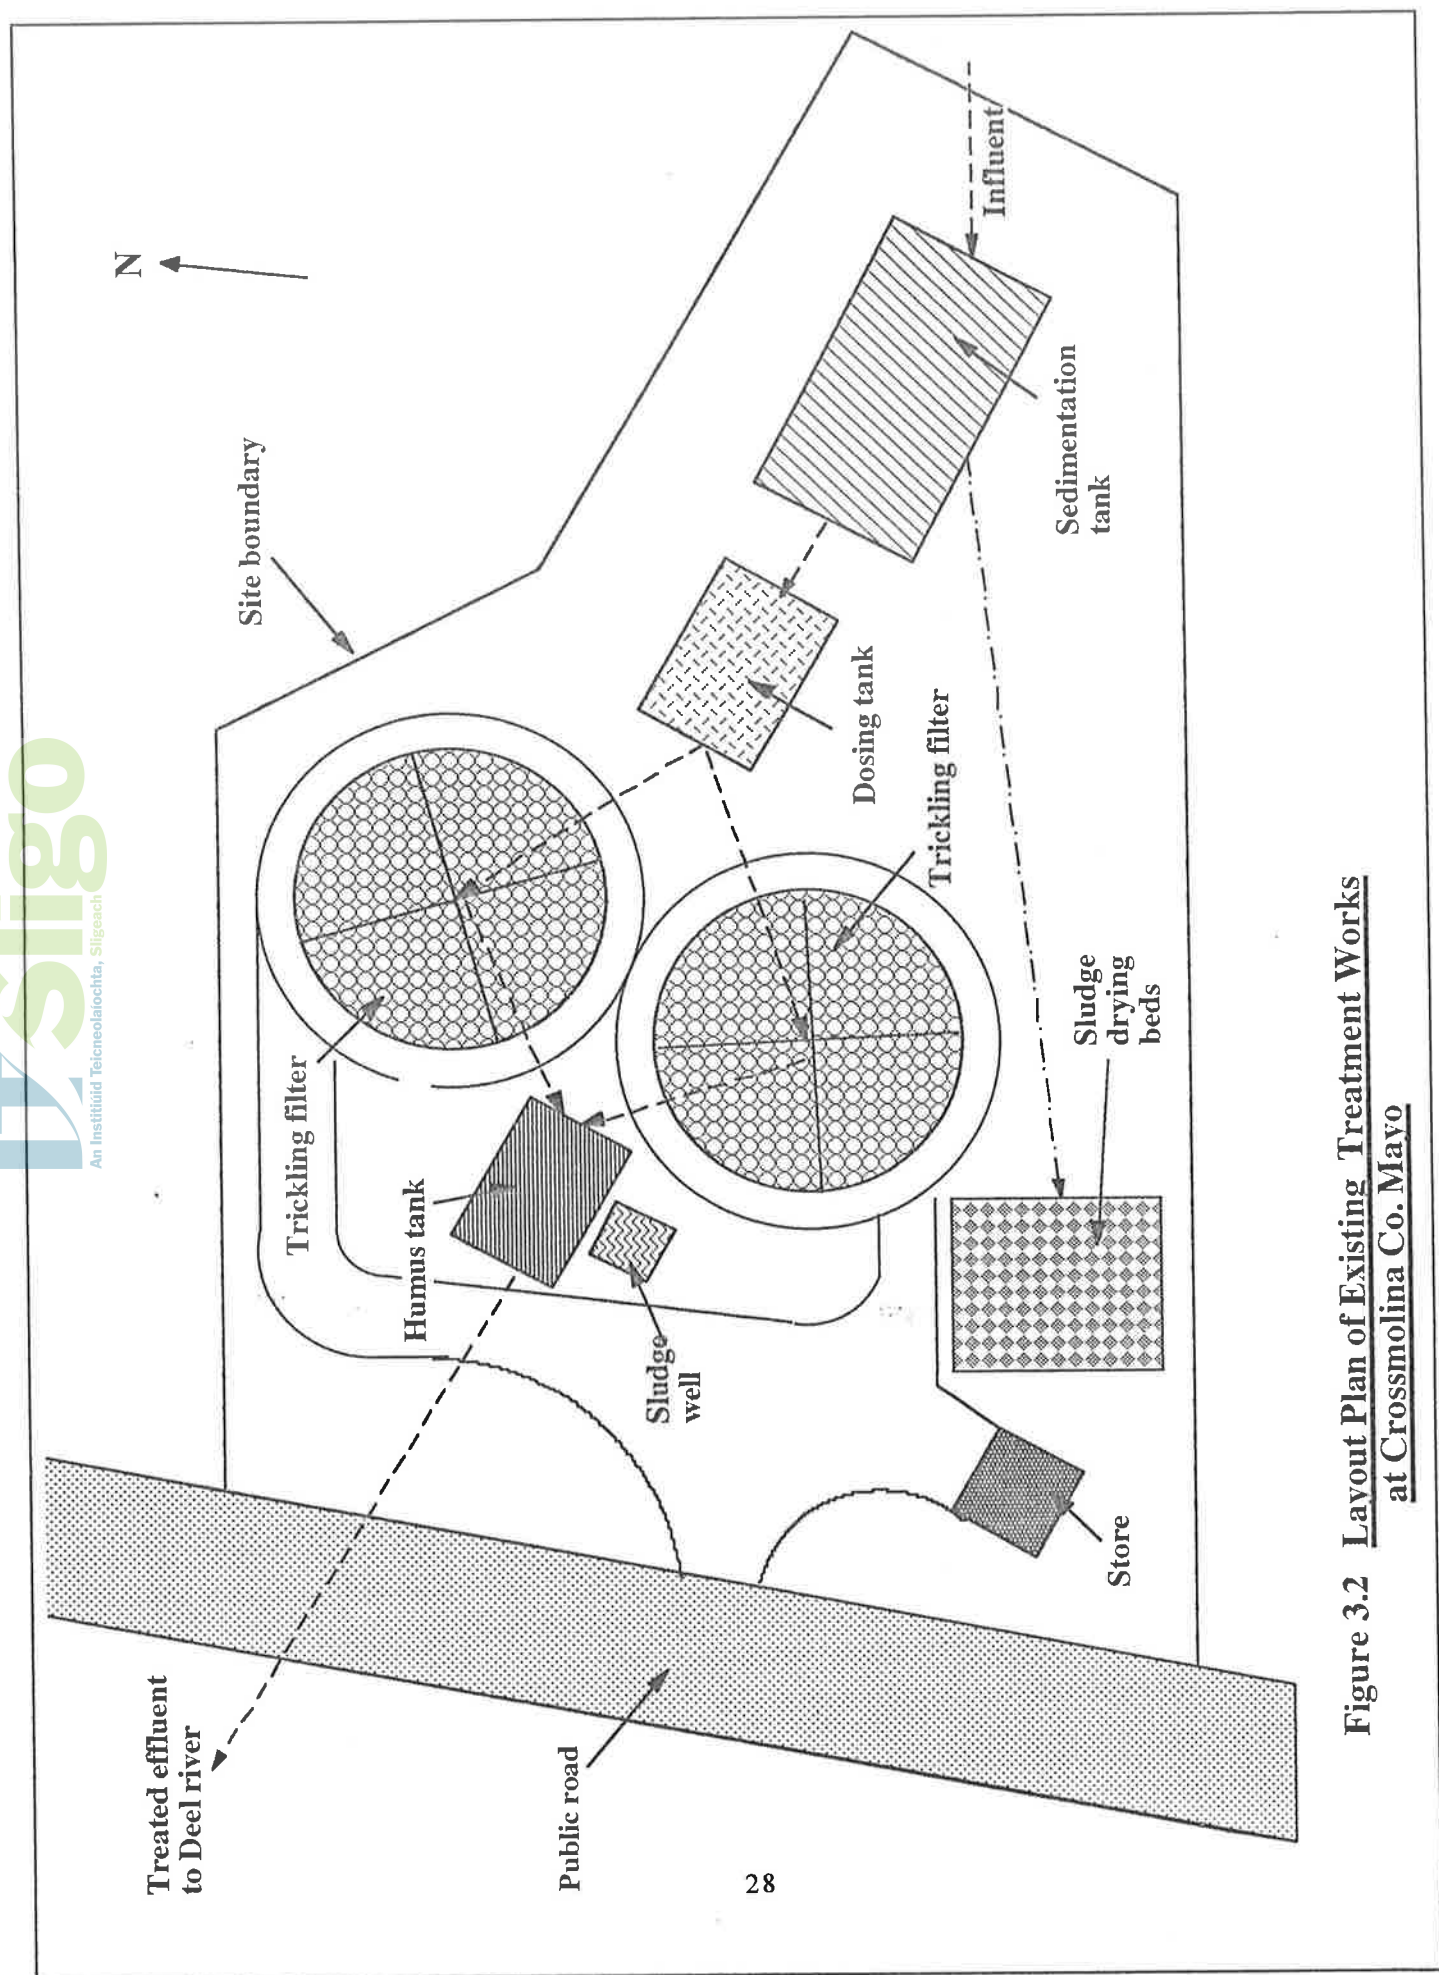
Layout Plan of Existing Treatment Works at Crossmolina Co. Mayo
